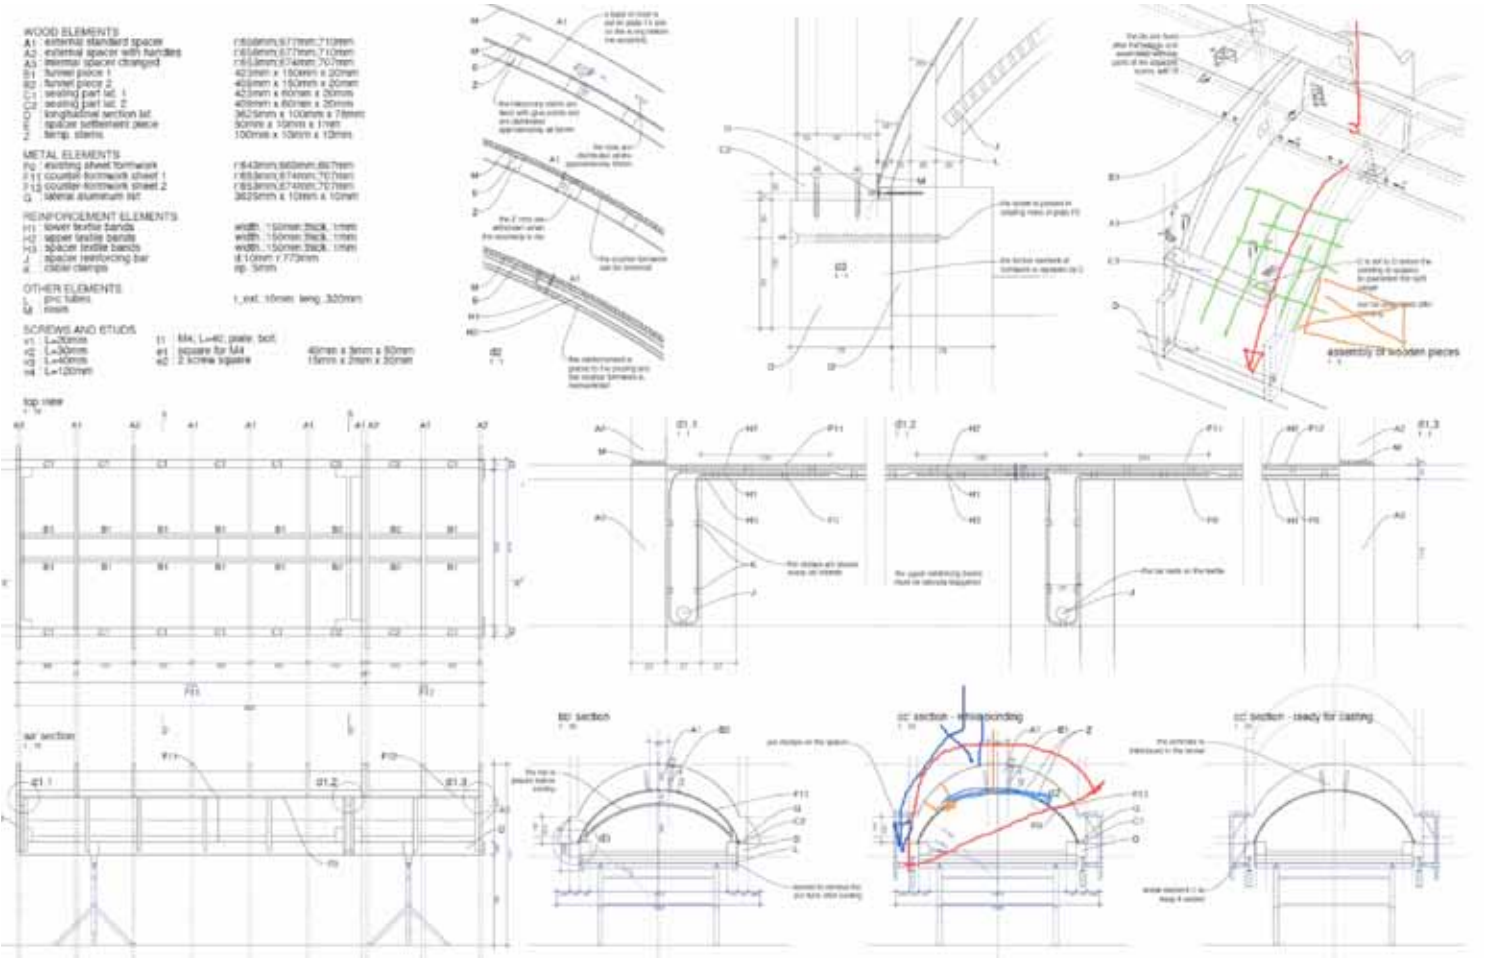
Sketches on drawing of new mold for shell, EU ENAC 2020
